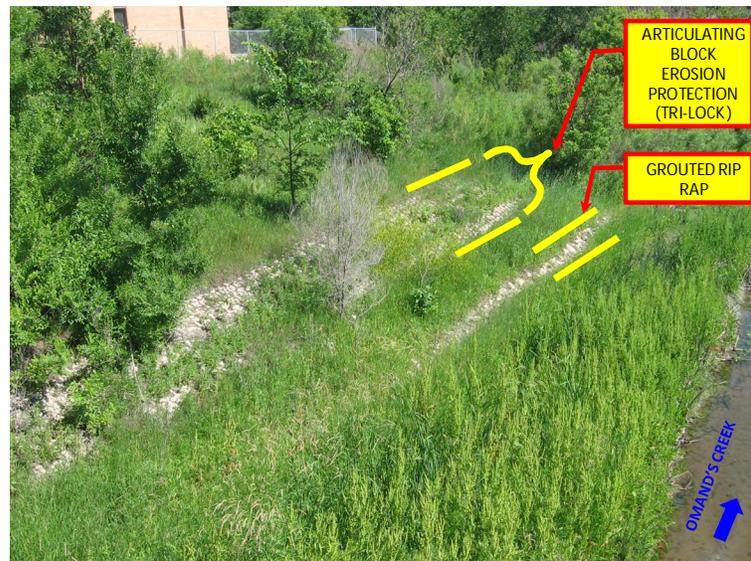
Articulating block erosion protection (Tri-Lock) and grouted rip rap on east bank. Photograph taken from bridge at Portage Avenue.
